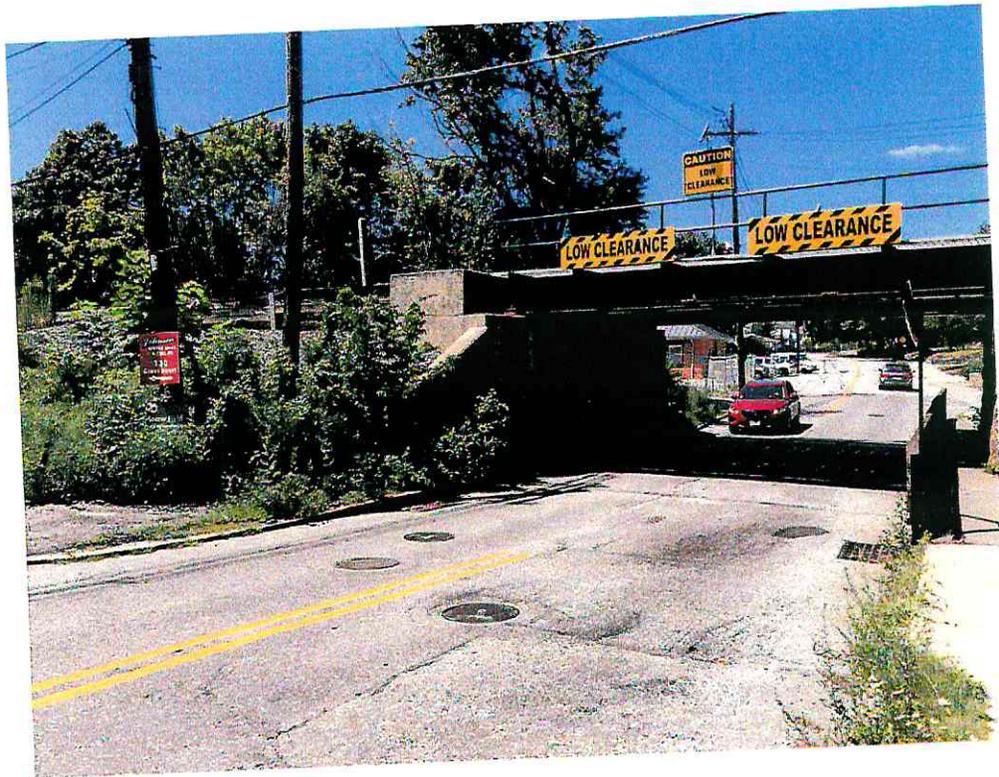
Location p – Cross St. looking west. Middle of Bridge.
